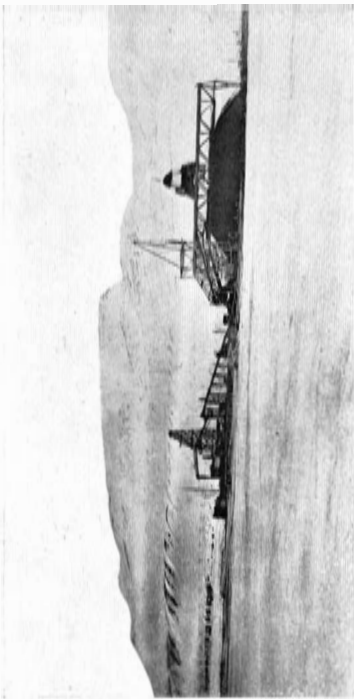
STOCK-PILE AND LOADING PLANT AT
